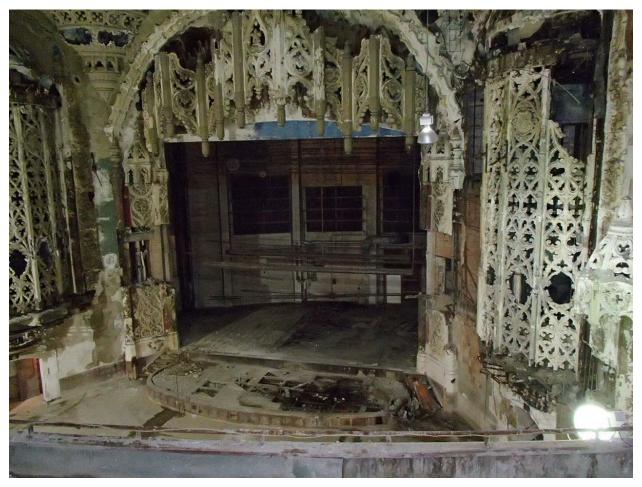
Portion of stage with curved front edge is a vertically operable section of floor with wood floor deck and framing spanning between steel beams. The wood framing has severely deteriorated due to water intrusion.
